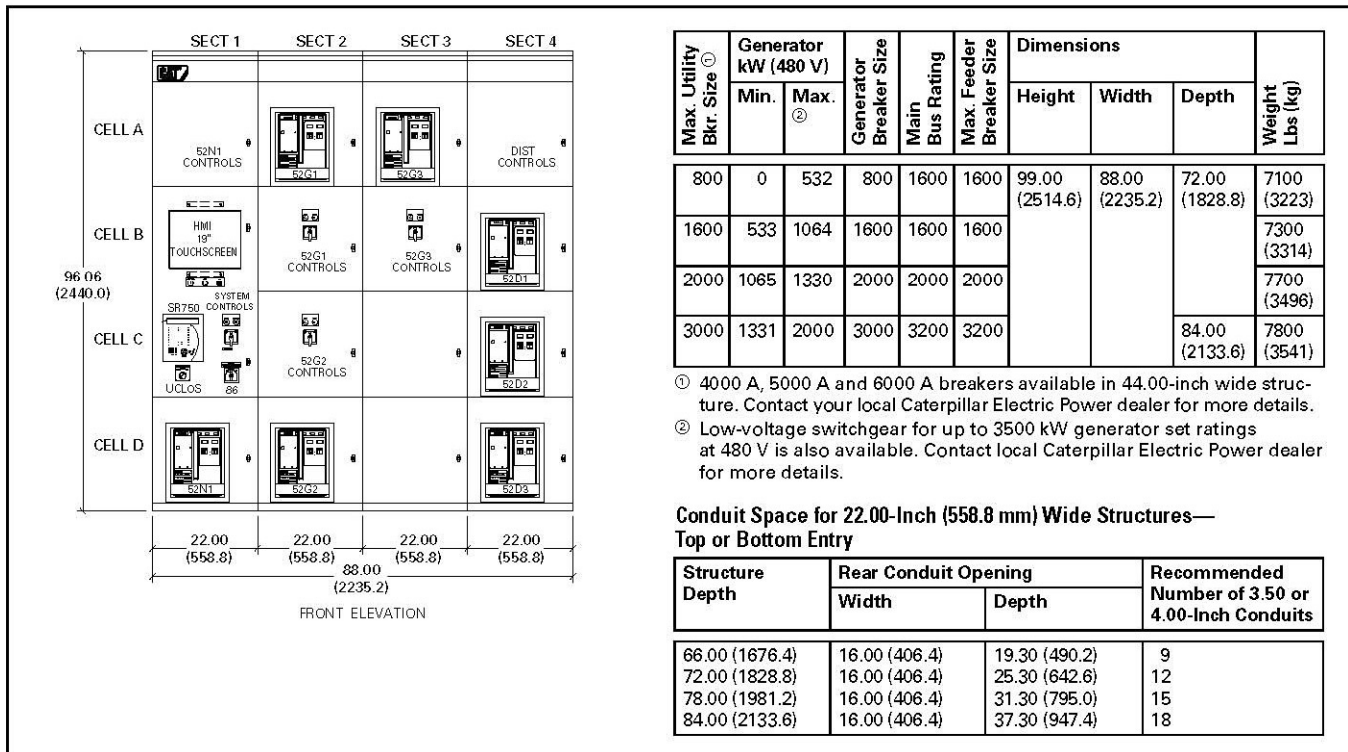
Typical XLM3 Low-Voltage Switchgear Layout (UL1558)
